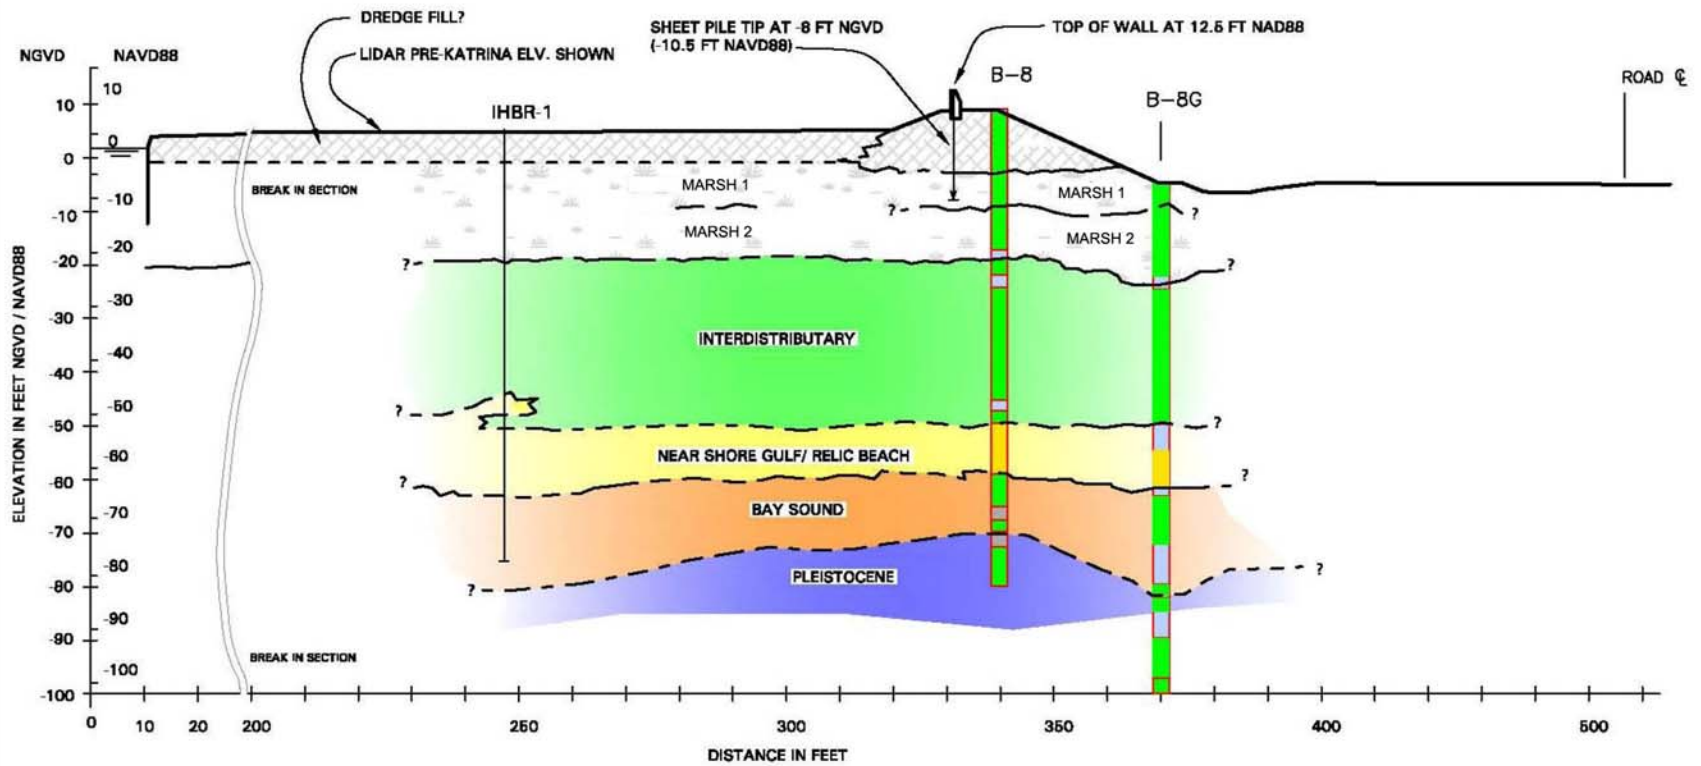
Profile of the north breach at IHNC East bank, view looking North
